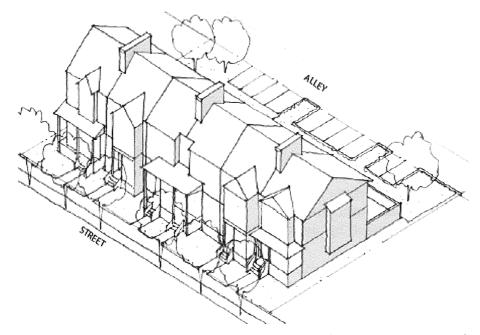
Typical building placement for townhomes from the Bellingham Municipal Code.
